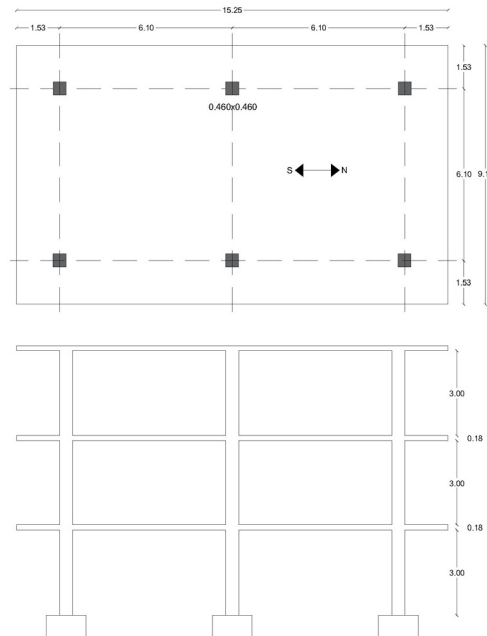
Specimen geometry – Flat-slab multi-storey frame [13] (m).
